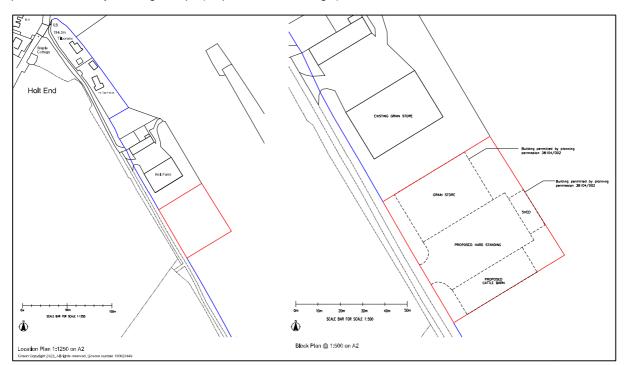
The proposed development layout plan for new farm buildings at Hall Farm Grainstore. Plan courtesy of Freeborough & Co. Surveyors Ltd; dated, November 2023 (drawing number HF–CB–01).
